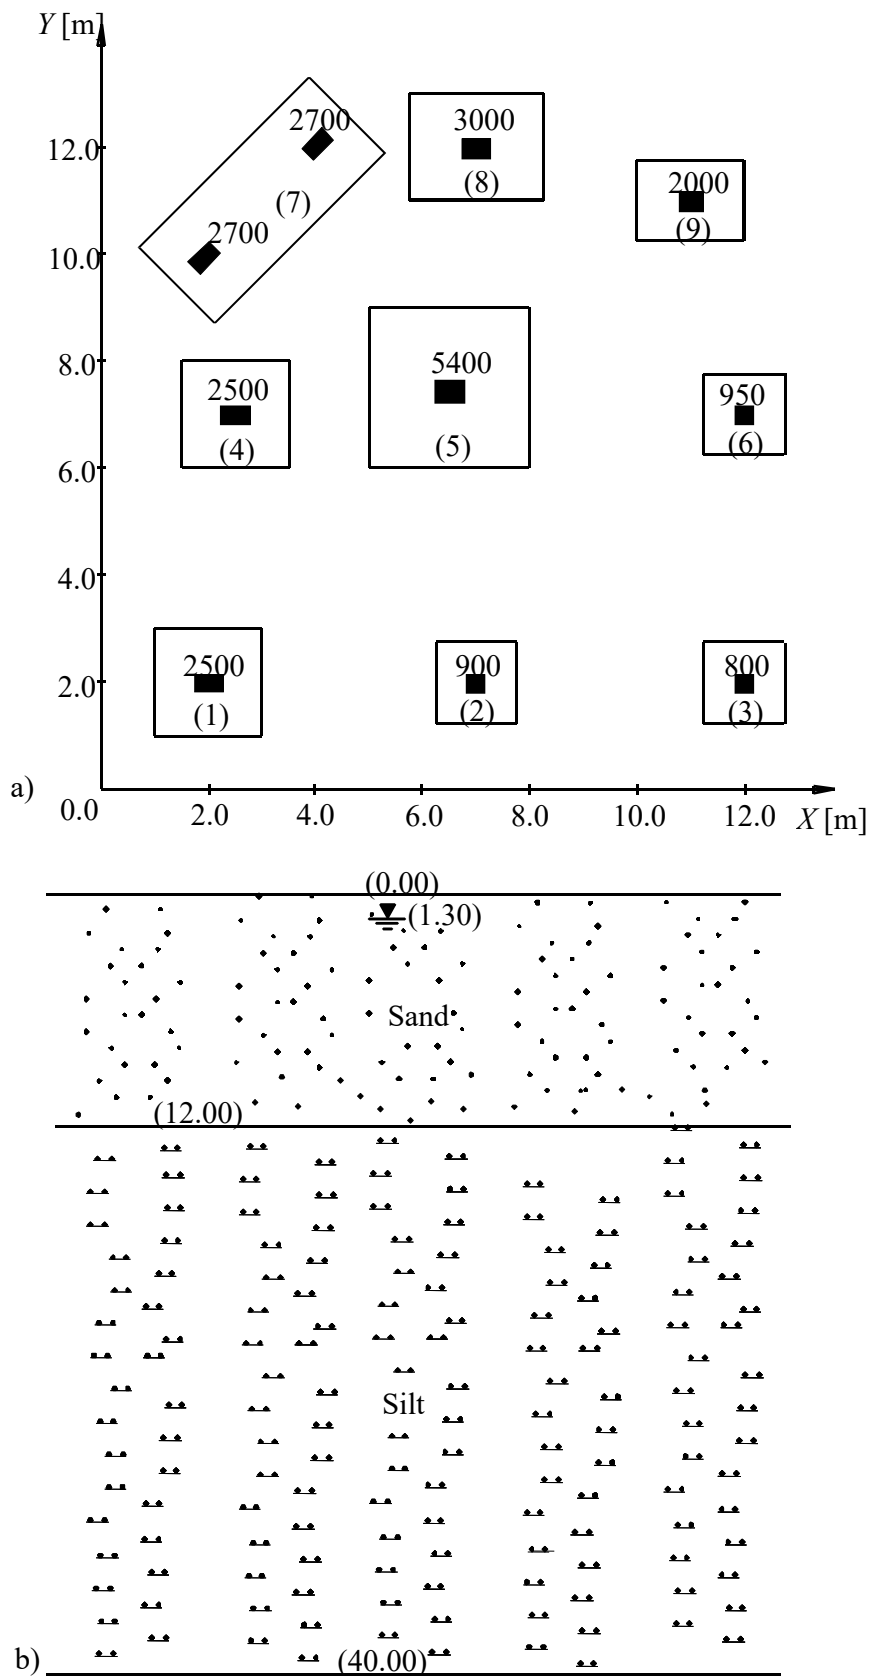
a) plan of the footing group with loads [kN], b) Section through the subsoil
